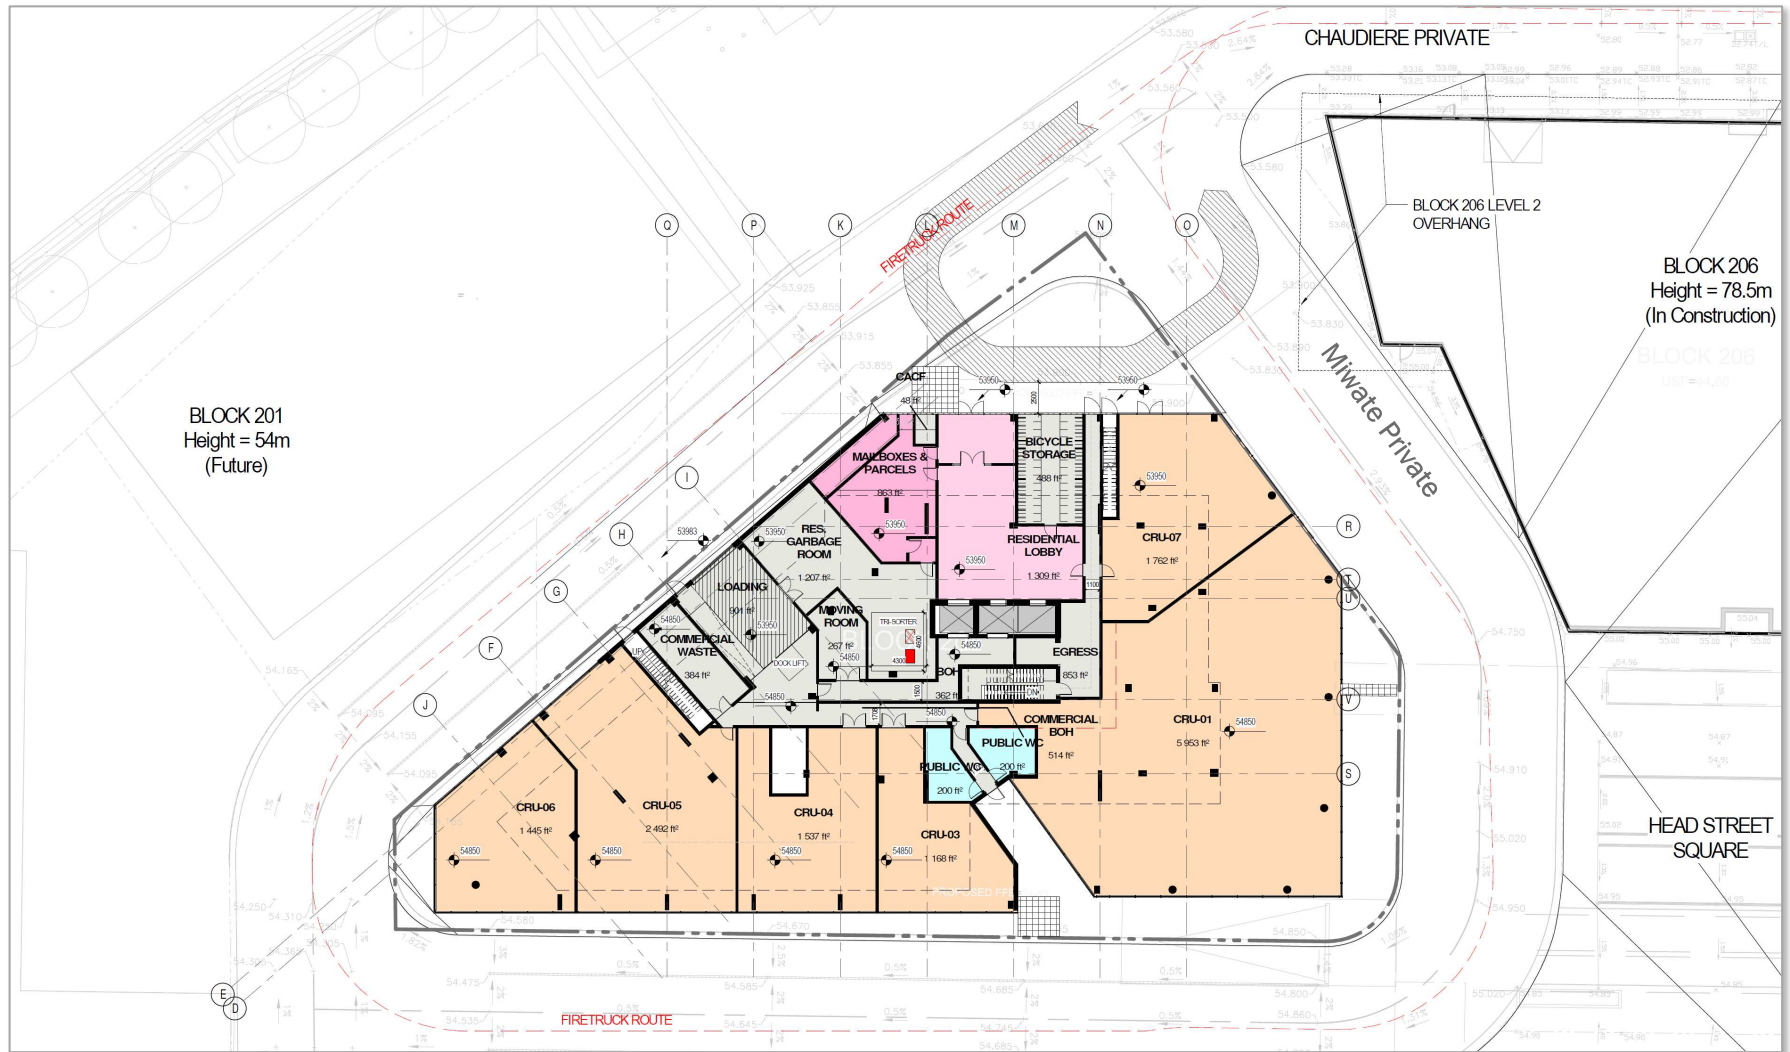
Preliminary Ground Level Floor Plan, February 2022
